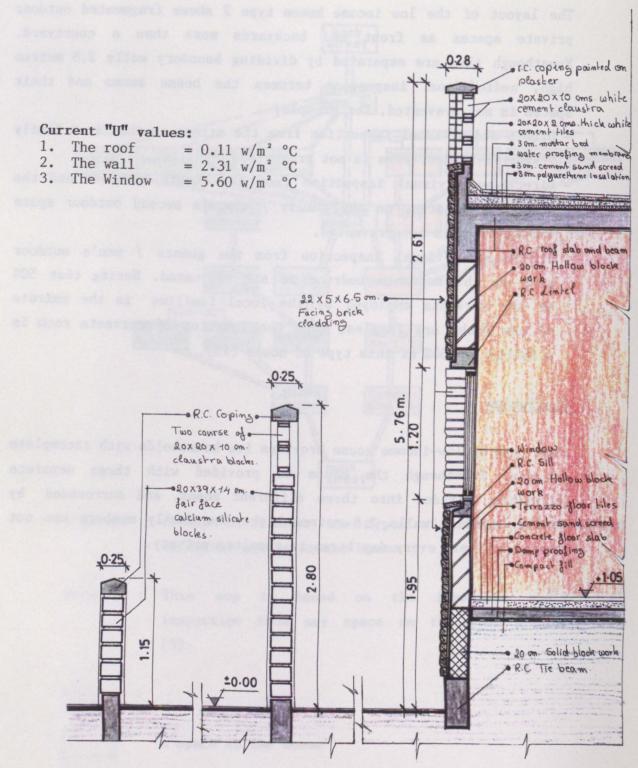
A sketch that shows a transversal section passing through the low-income house type 2 (26)
